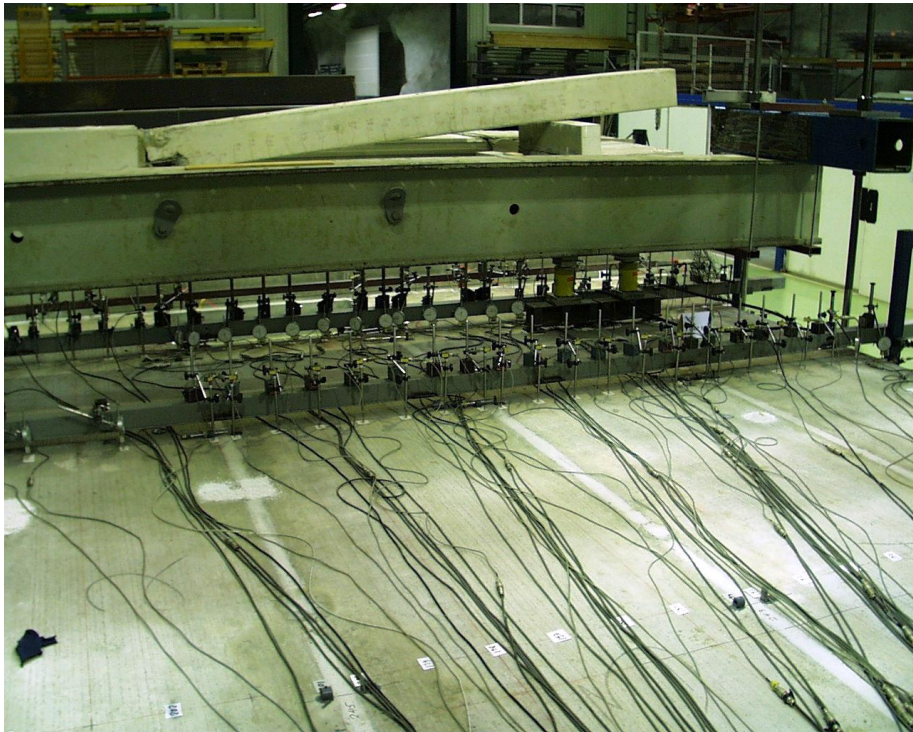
Overview on floor before grouting. The vertical objects in the joints are wedges.
